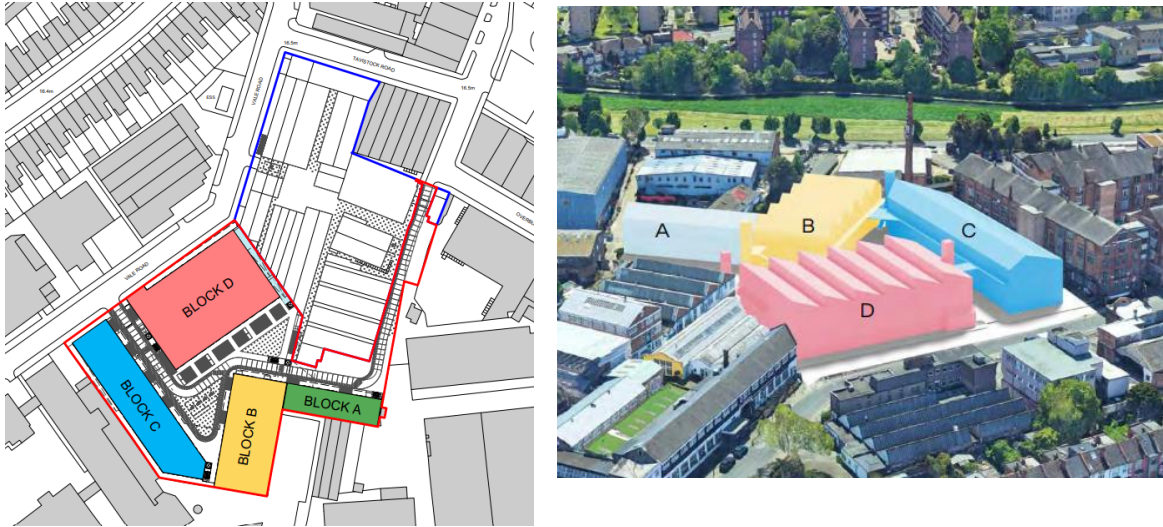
& 2: Proposed Site Location Plan & Massing Image
